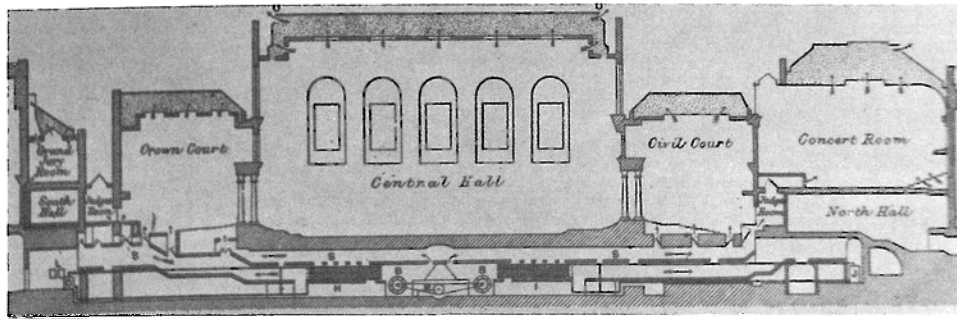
Liverpool, St. George's Hall, constructed 1841-1854, longitudinal section showing heating and ventilation system installed by David Boswell Reid (*Civil Engineer and Architects' Journal*, xxvii, 1864)
